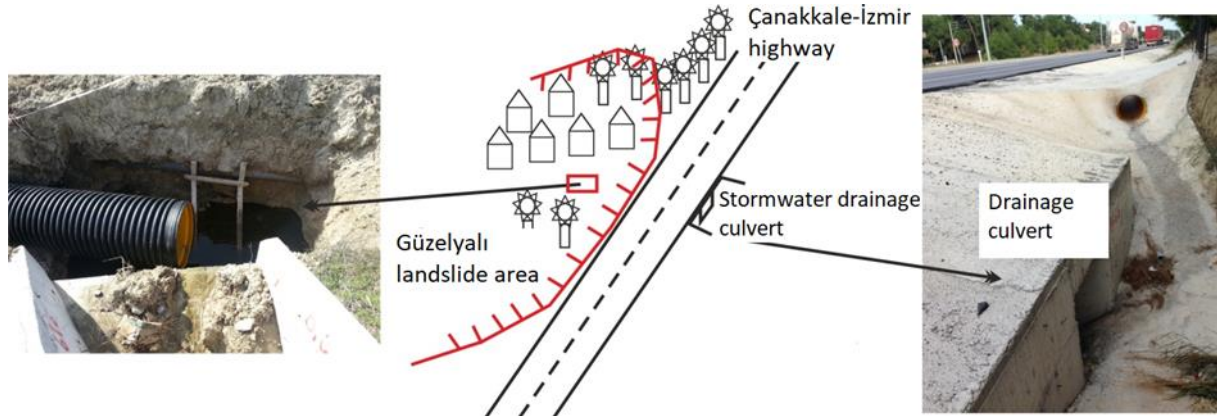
Stormwater drainage culvert thought to have affected the Güzelyalı landslide (UTM: 445325 E, 4434504 N).
